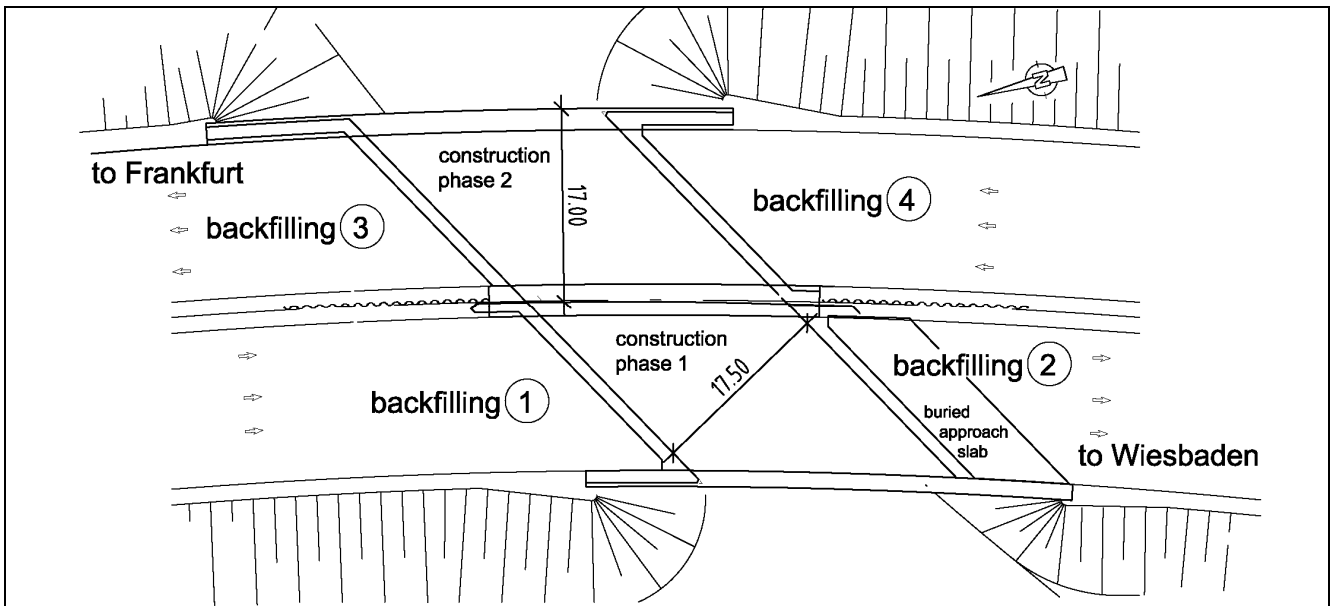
Site plan of structure BW 15 at motorway A66 between Frankfurt/Main and Wiesbaden
